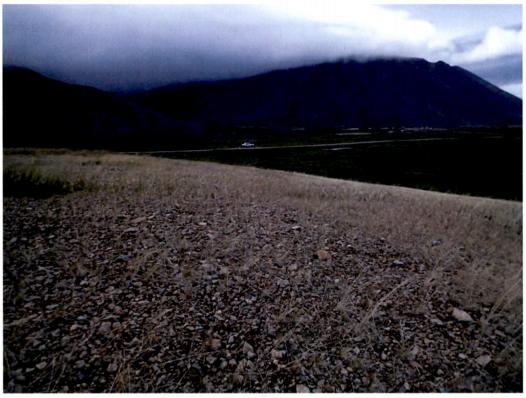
Site 7 Landfill - View of west side of landfill area, facing south.
